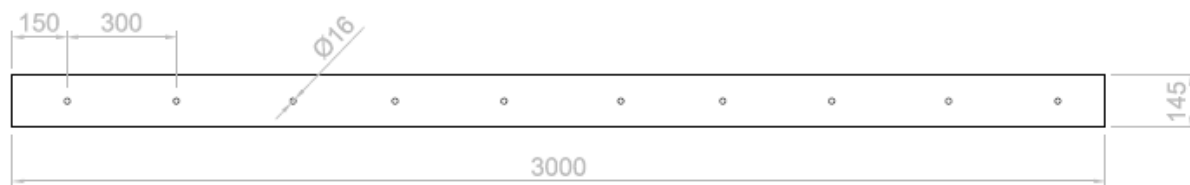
Plan view of the 20 laminations that composed the stress timber deck tested. The dimension of each lamination and the distances between the holes for steel bars are described also. The dimension of each lamination was 3000x45x145mm and the steel bars used were 10 of Ø16mm.
